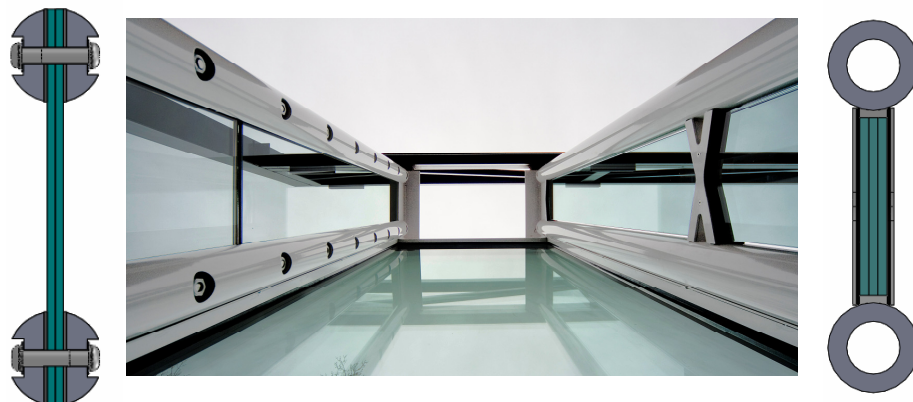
Plate girder and lattice girder proposed for the glazed fin
